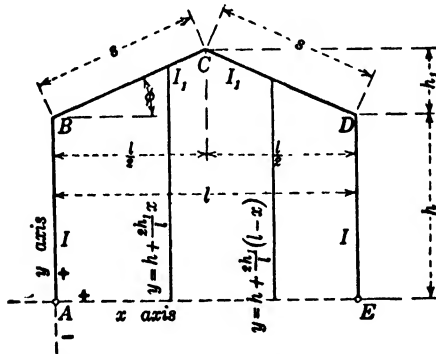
Rigid Frame with Ridge Roof. (See p. 269).
